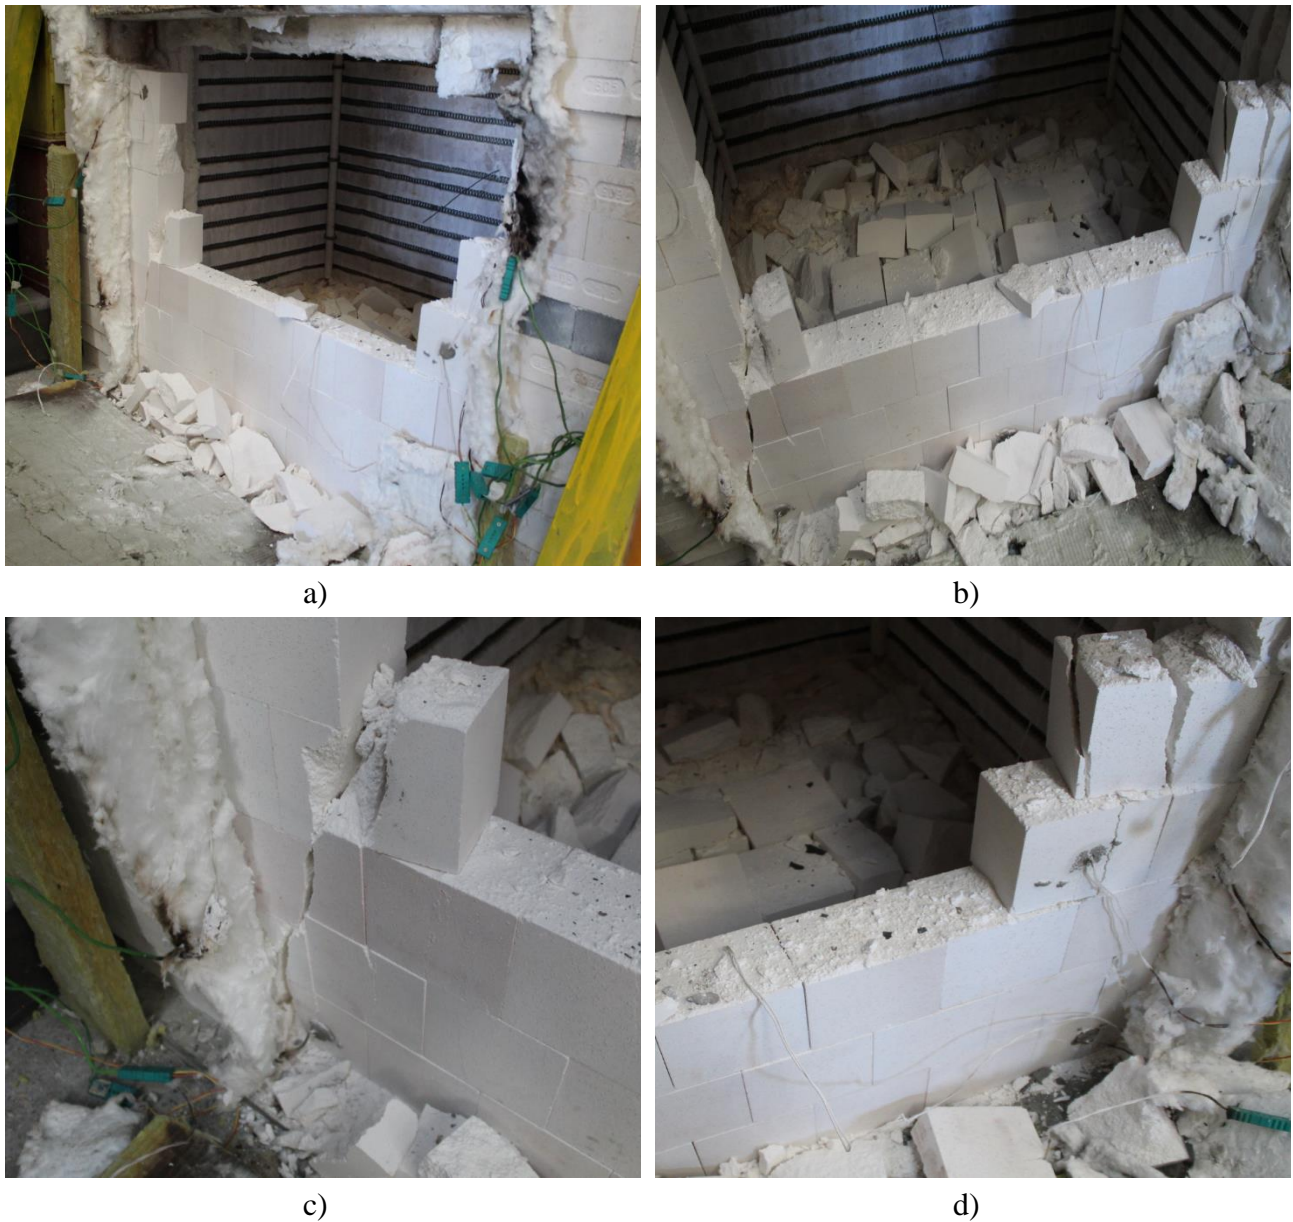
Test series S05.HT.LL10 – Failure of specimen S05.HT.LL10.02: a) Overview; b) Top view; c) Details of bricks' failure from the left side of the wall; d) Details of bricks' failure from the right side of the wall
